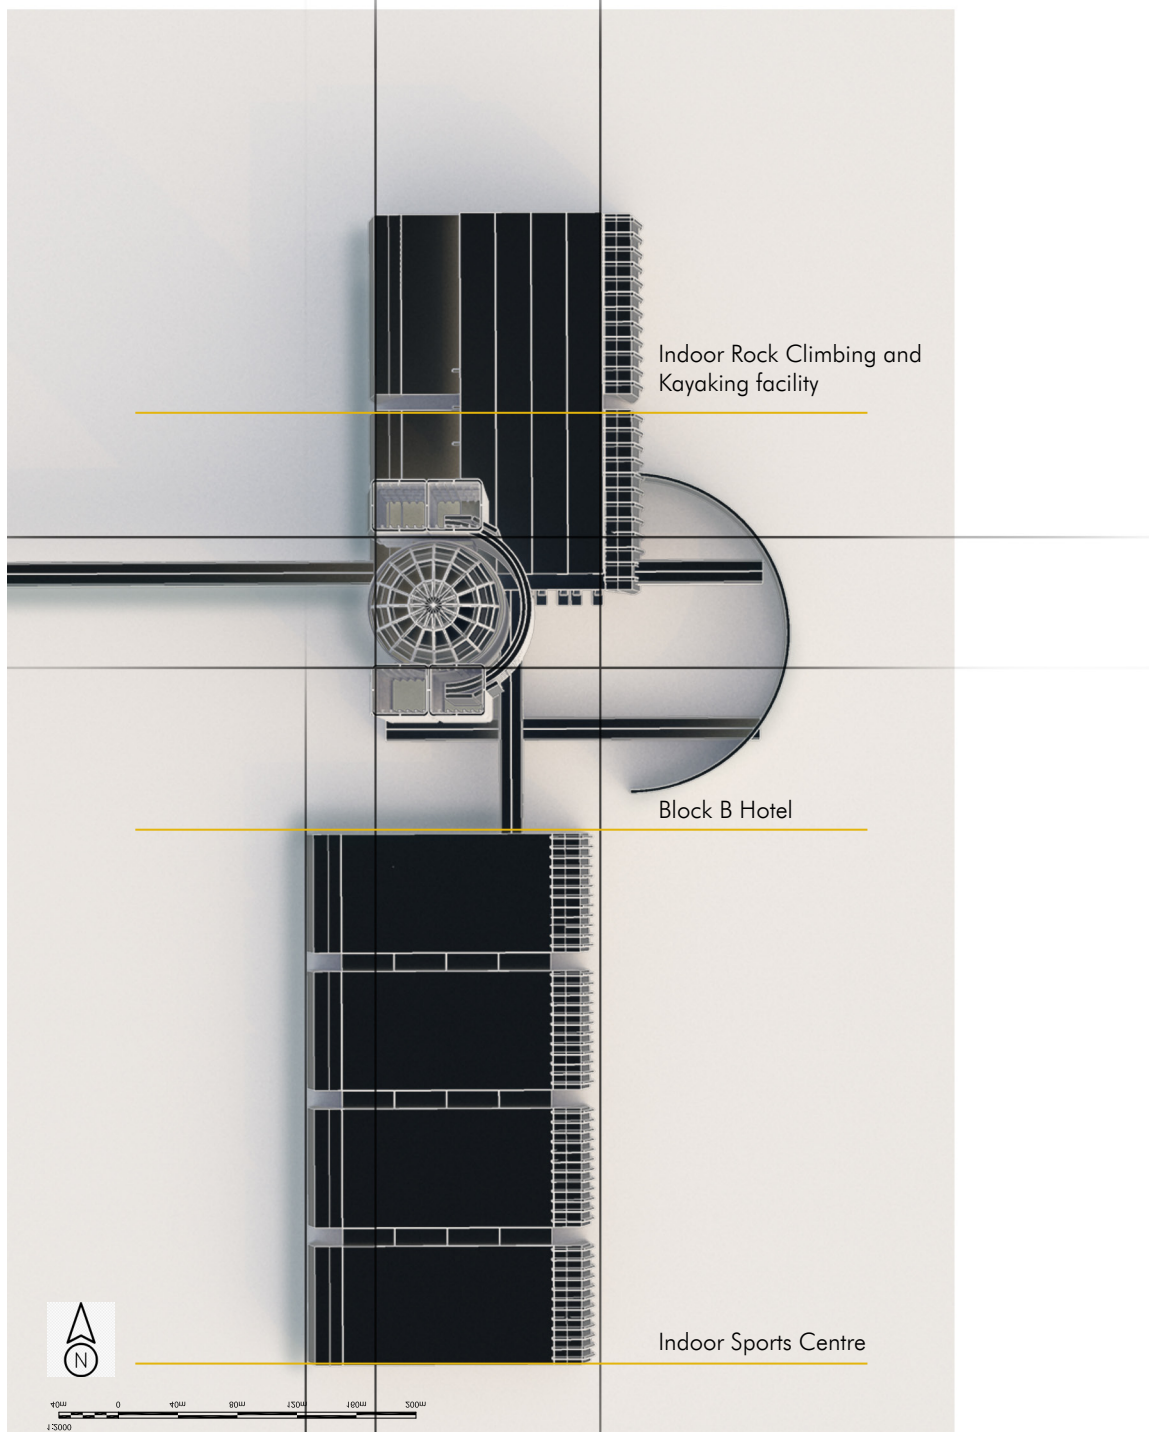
Developed plan indicating proposed Block B Hotel, Indoor Rock Climbing, Kayaking Facility, and Indoor Sports Centre.
